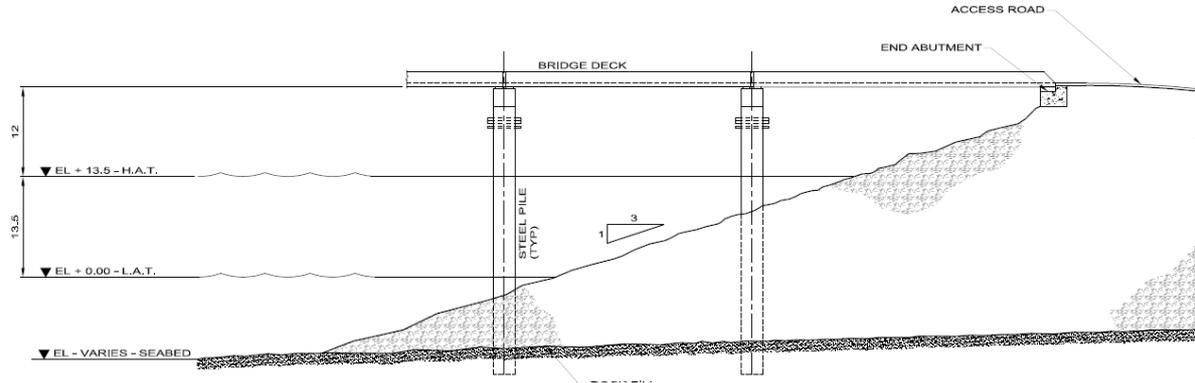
Drawing showing an example landfall causeway at the end of the fence.
